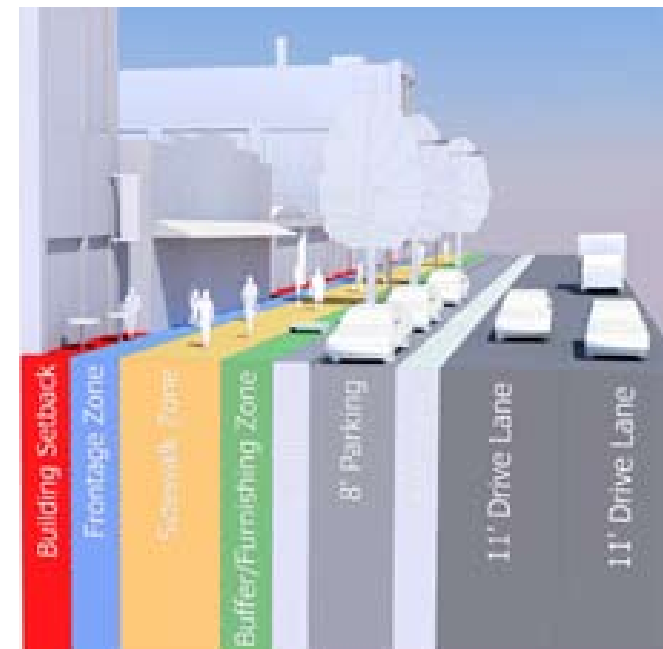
Public Realm Elements, Greater Downtown Area Plan
